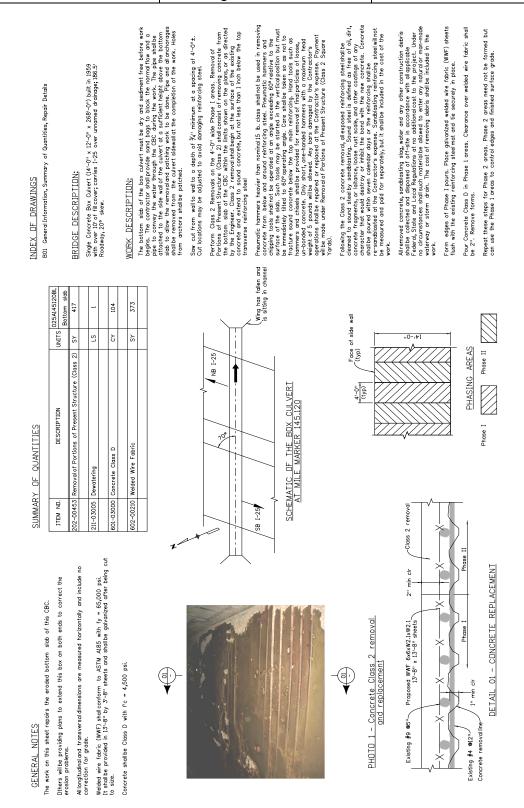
(L)-1 Sample Details for Repairing the concrete bottom slab of a box culvert
